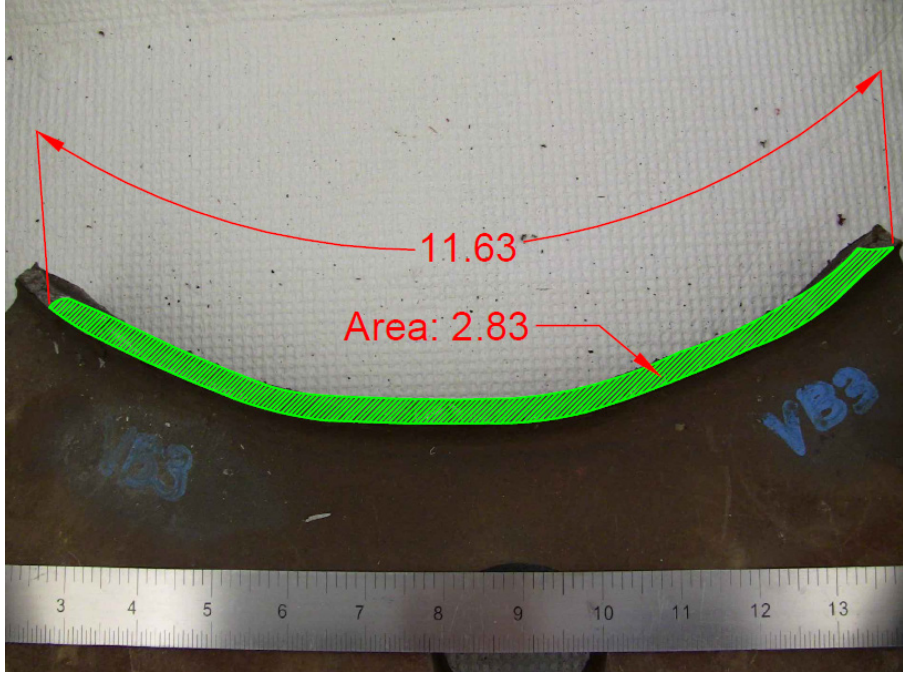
Photo. Specimen 2U3 fracture surface.
